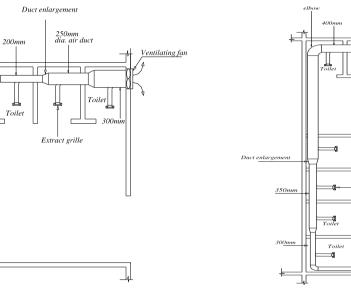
Plan of Ventilation Duct System for 4 Toilet Rooms
